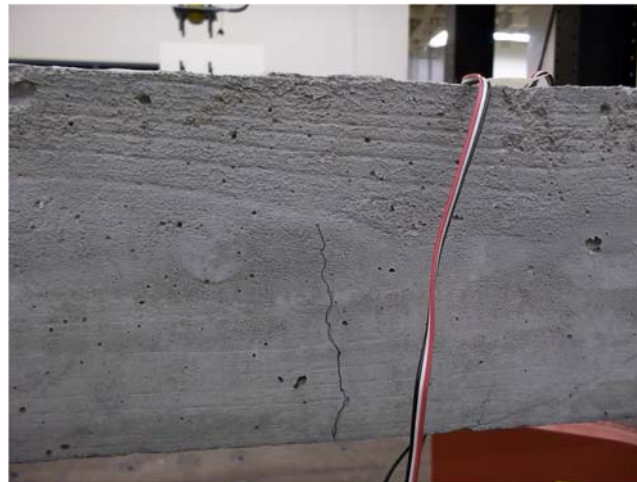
Cracking of reinforced concrete beam with excitation amplitude of 0.05".
